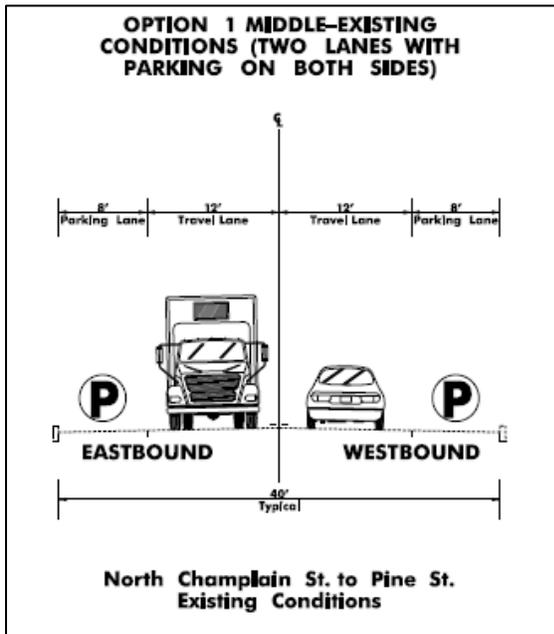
Two-Lane Roadway Cross Section with Parking on Both Sides – Middle
